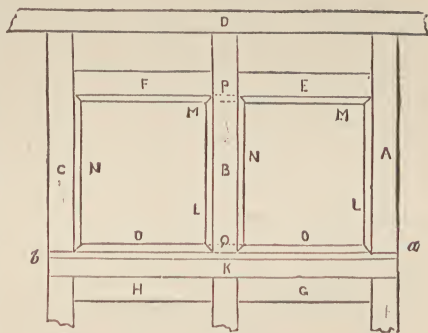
CASEMENT WINDOWS IN FRAMED HOUSE.
